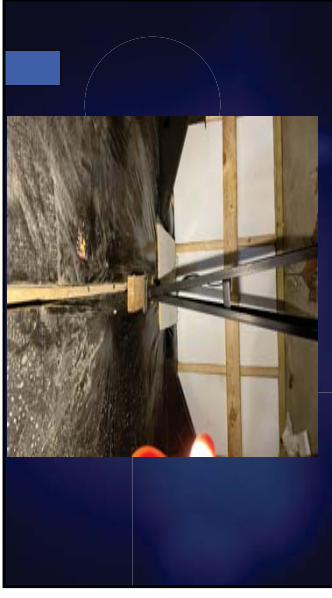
Floor connection through bottom board (Fasteners must penetrate the rim joist by a minimum of 1½ inches)
